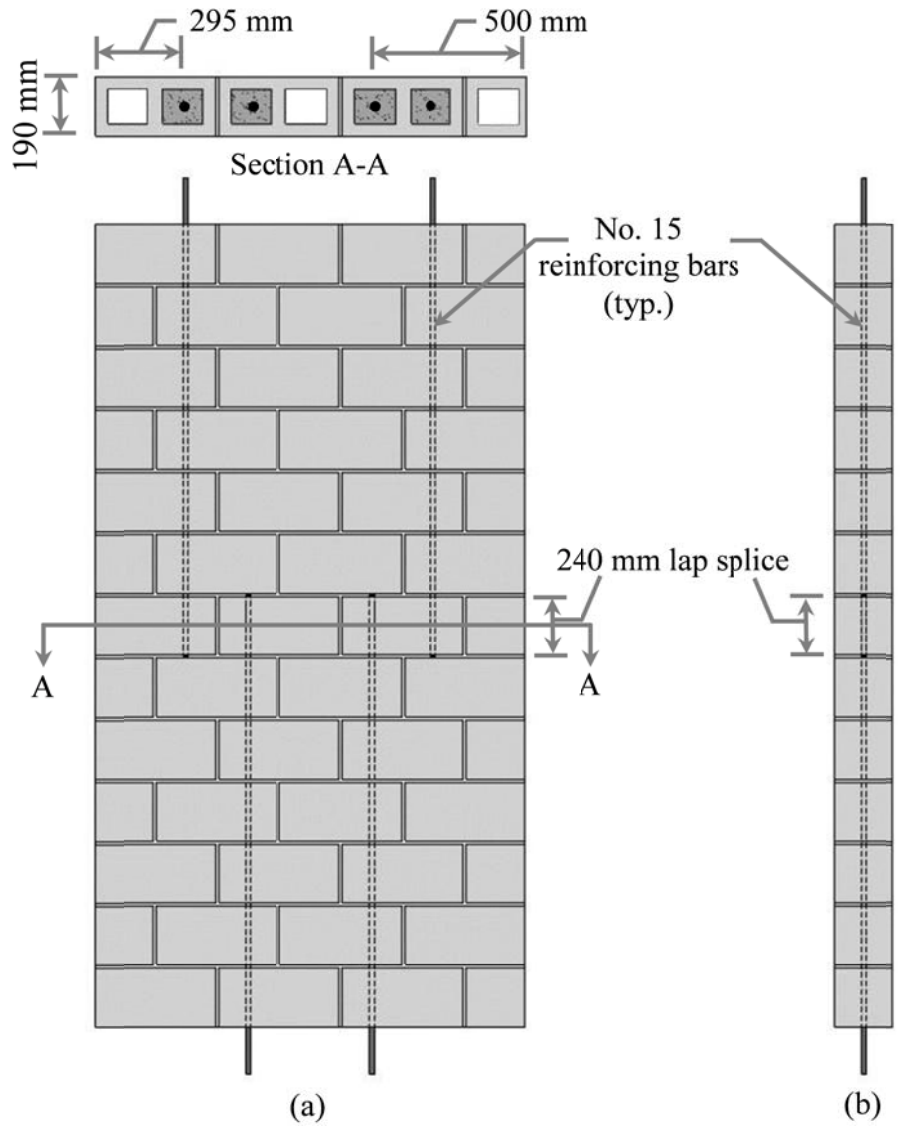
A-3: Remedial Wall Splice Specimen with Un-Grouted Confinement Cells (UGCC): (a) Elevation Including a Section at Splice Level, and (b) Side Profile.
